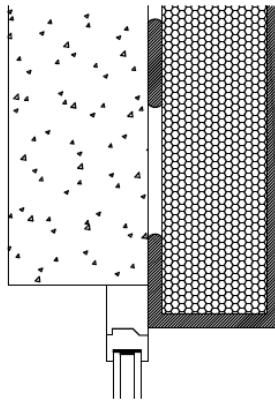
Window mounted within the wall on which the façade system is mounted.
